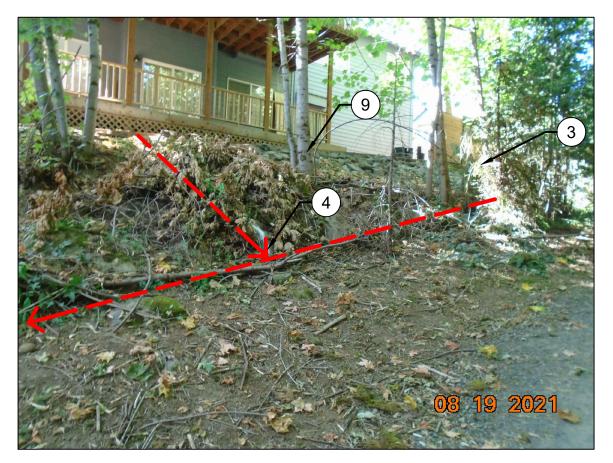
swPP-014775 APPEARS TO BE LOCATED NEAR LOWER SECTION OF SLOPE
